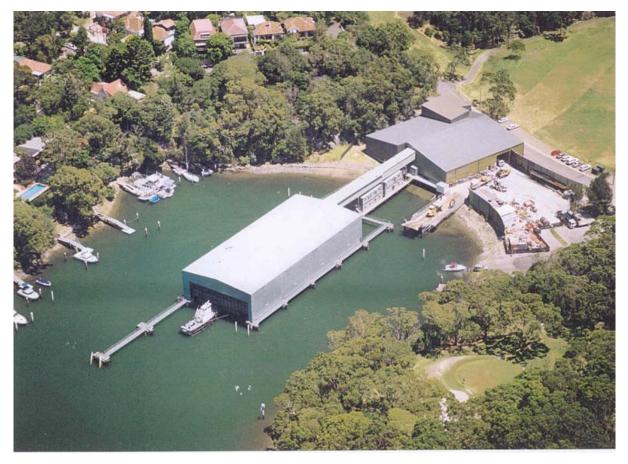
North Side Storage Tunnel Barge Loading Shed at Tunks Park
